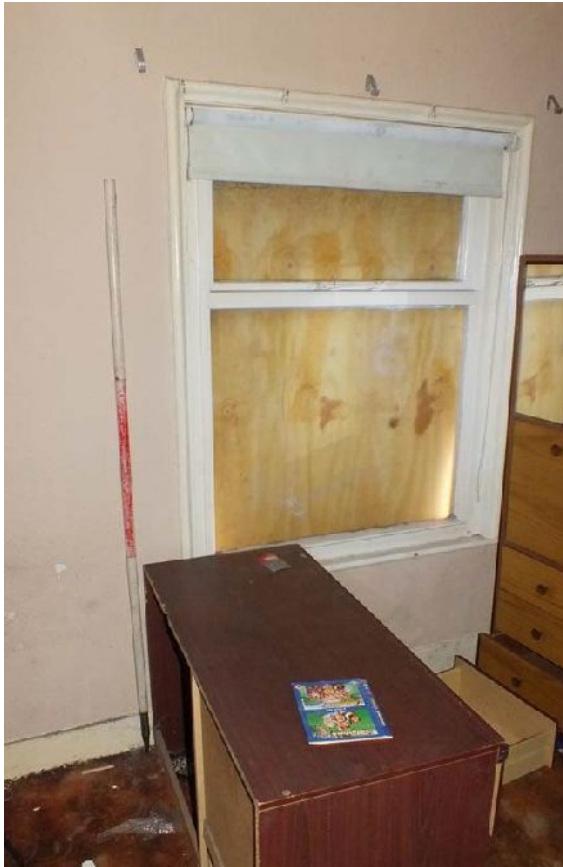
(left): Window in the north-east elevation, Room F5, viewed from the west
